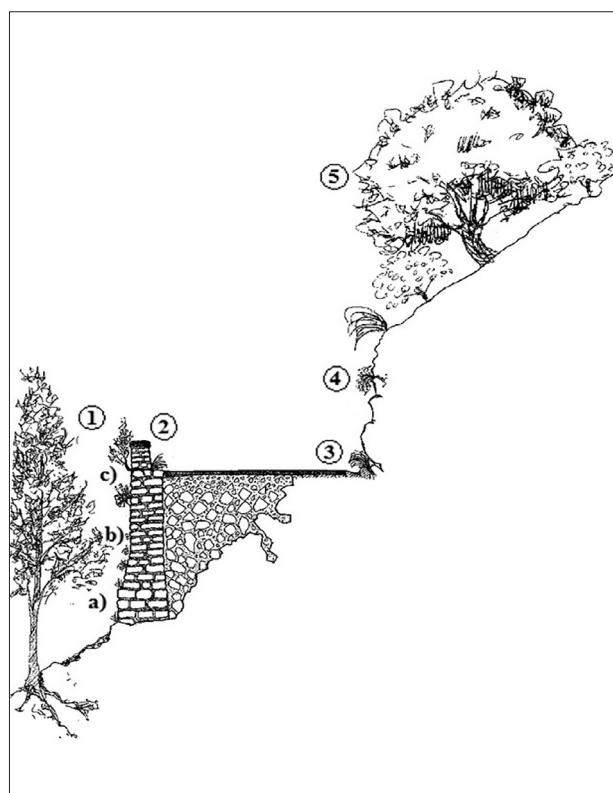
Cross-section of the habitat of the Monte Pellegrino road system: 1) retaining wall (a – base plinth; b – sloping face; c – vertical face); 2) downhill-side road margin (masonry guardwalls or parapets); 3) uphill-side road margin; 4) rock cut slopes, 5) natural slope.
